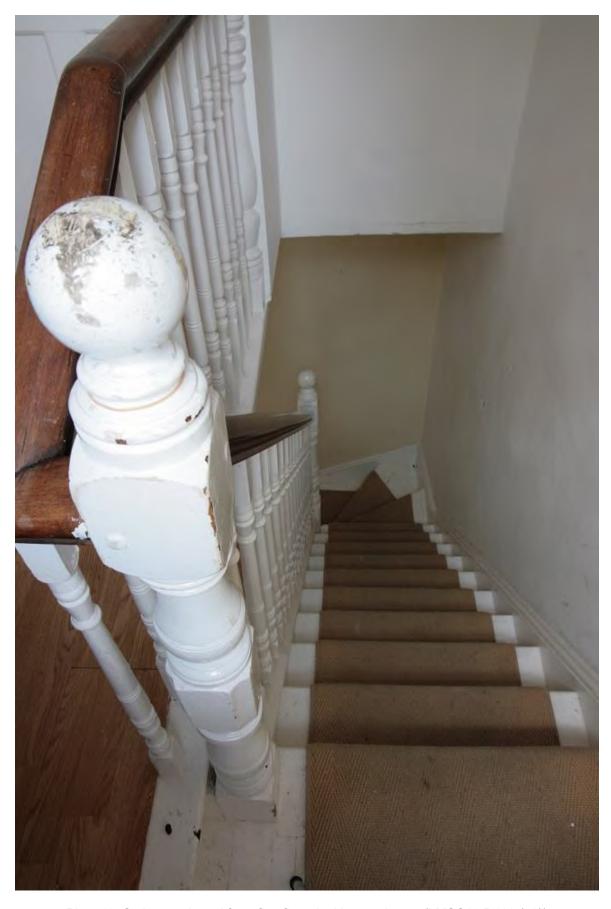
Staircase viewed from first floor, looking northwest (LMSC16 D100 (72))
